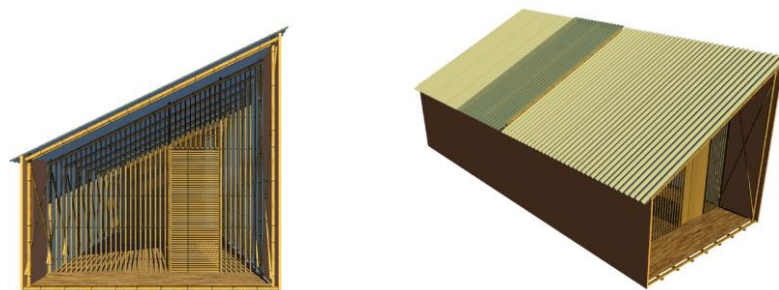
Right: Lateral (entry) façade with vertical smaller bamboo canes to achieve shading. Left: demonstrating the translucent part of the roof that allows for the entry of sunlight. Source: Rodrigues, Barbara
